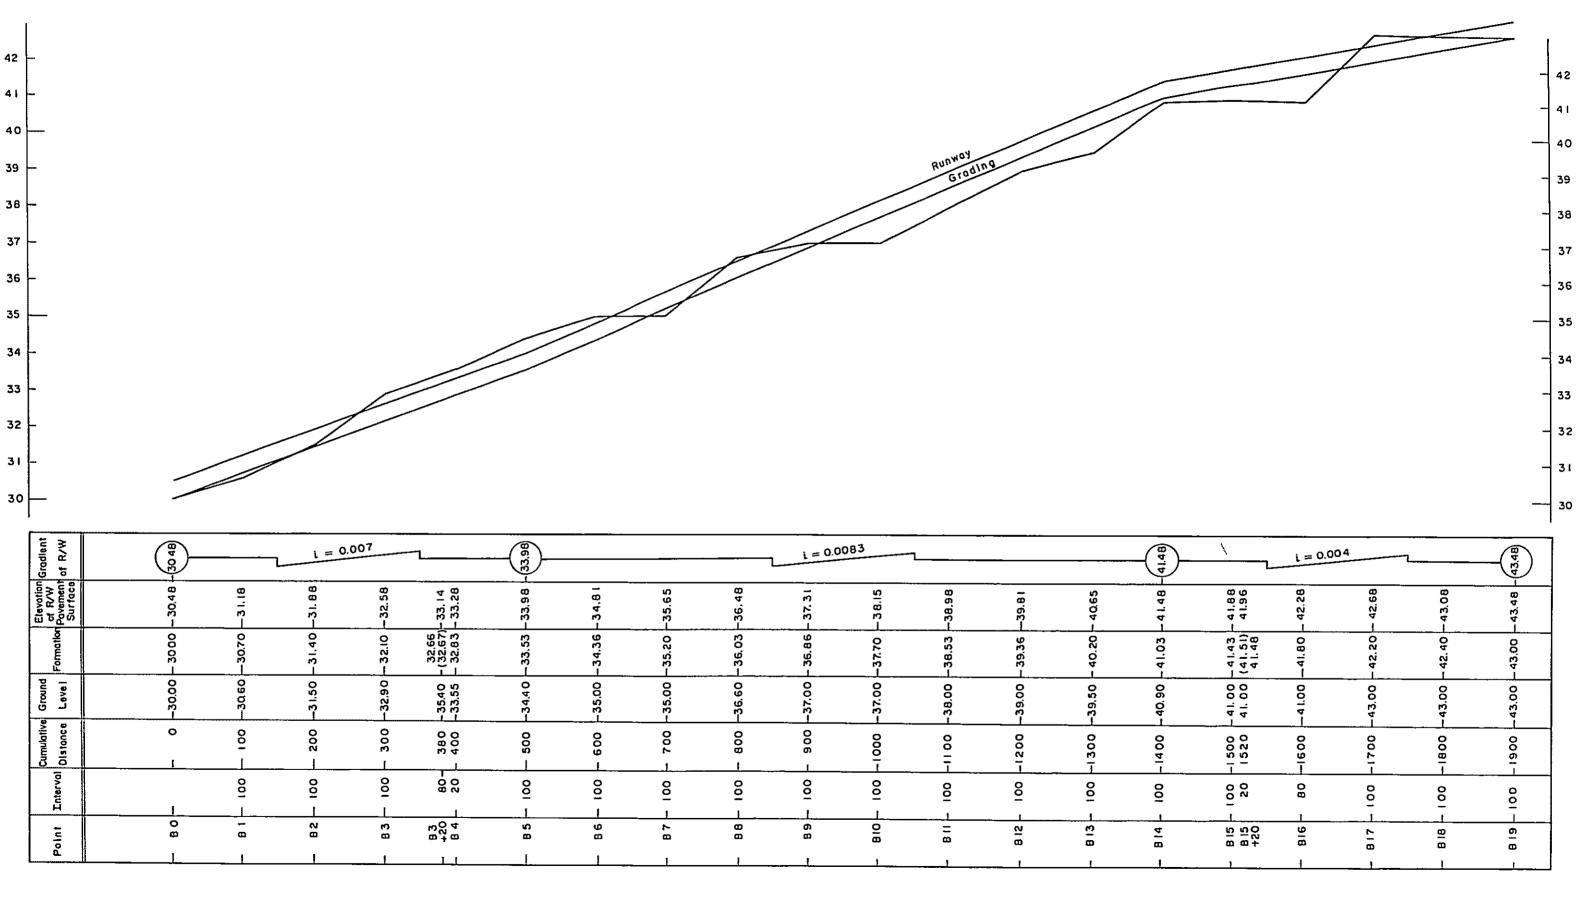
Longitudinal Section along Center Line of Sub-Runway
